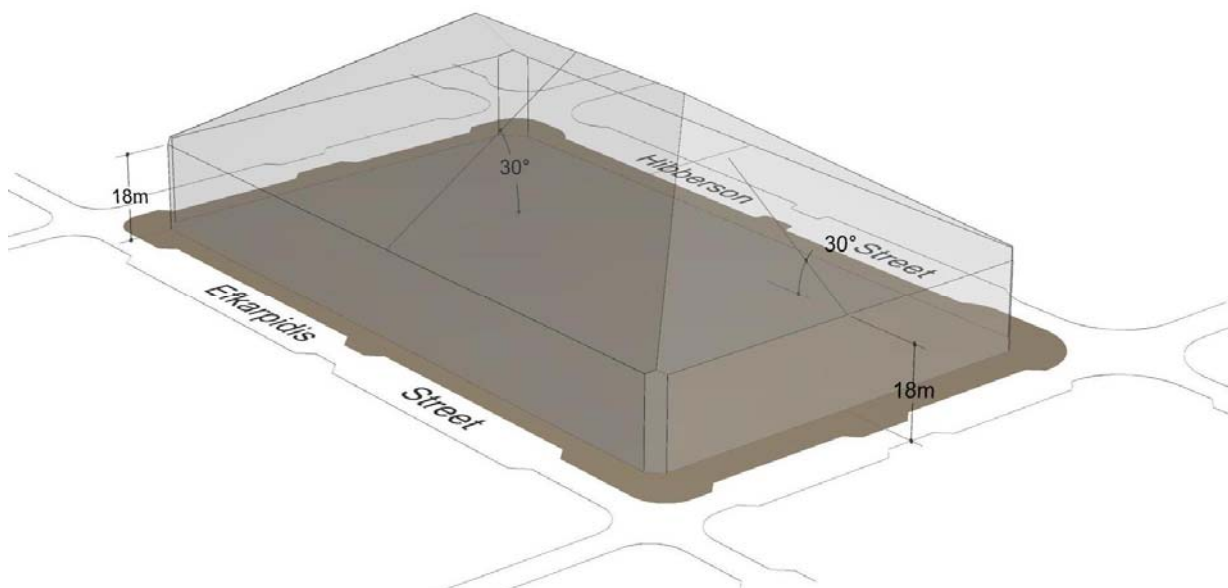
Building envelope in Precinct 1a (north side of Hibbersson Street)
